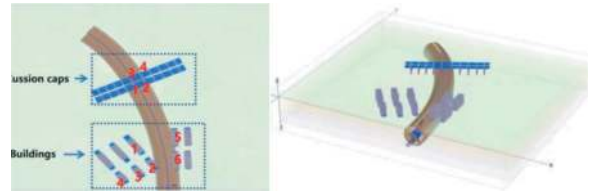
Calculation model of shield penetrating residential buildings and elevated structures. (Blue round tubes are tunnels, brown colour is negative interface)
